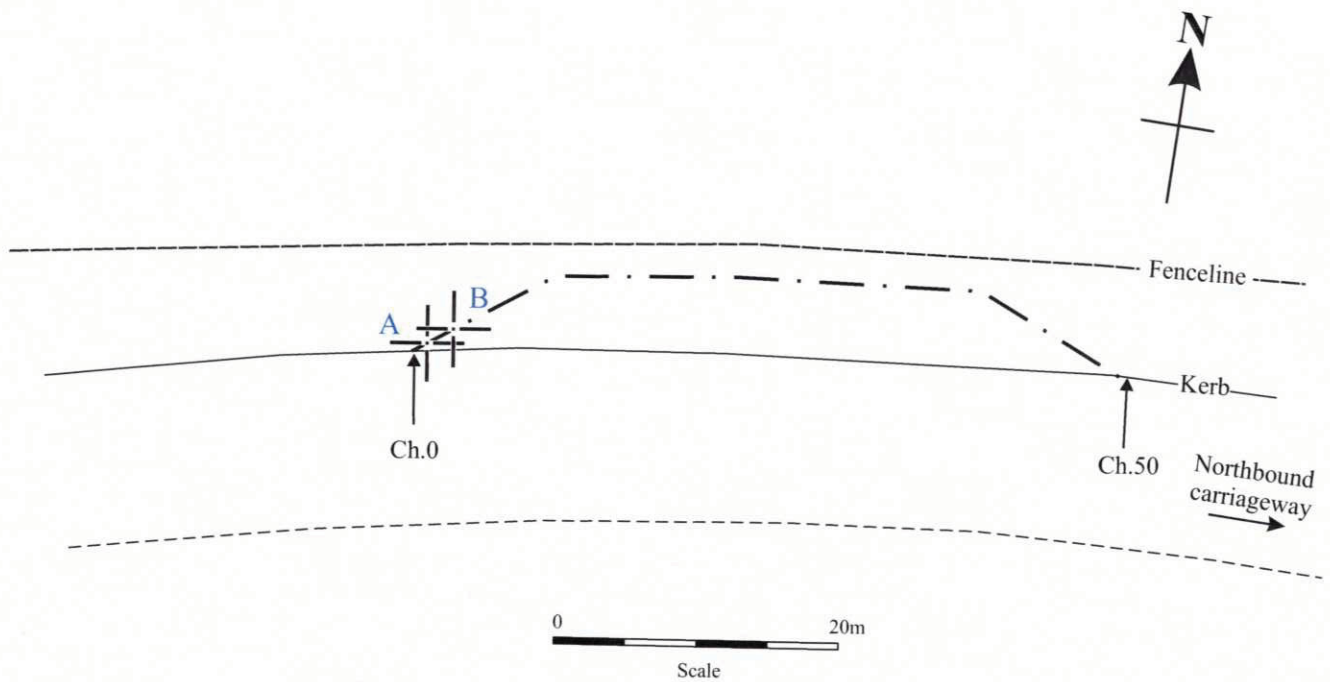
Plan showing the extent of the stripped area at Site 14 and the location of the sample section shown in Fig. 10. Scale 1:500.
